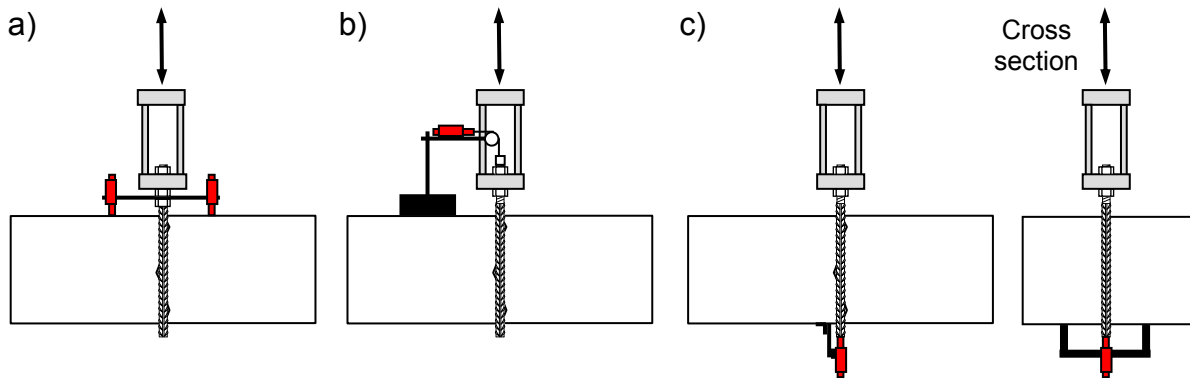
Measuring reinforcing bar slip: a) Cantilever construction; b) Heavy support construction; c) Frame with attached transducer and sensor head directly touching the reinforcing bar
